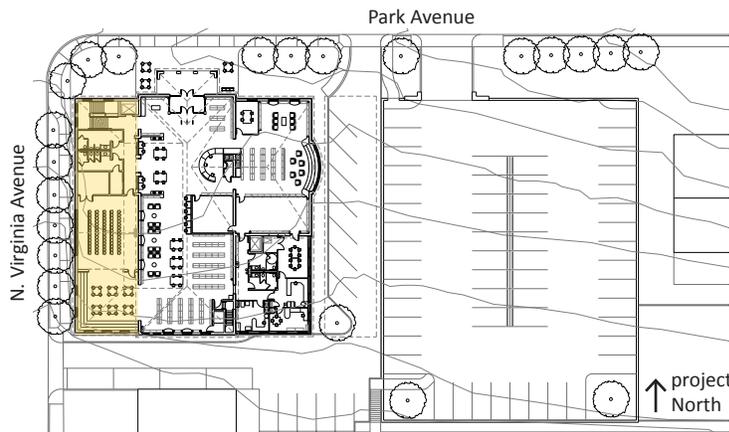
West Expansion Main Level Plan + Parking Deck
